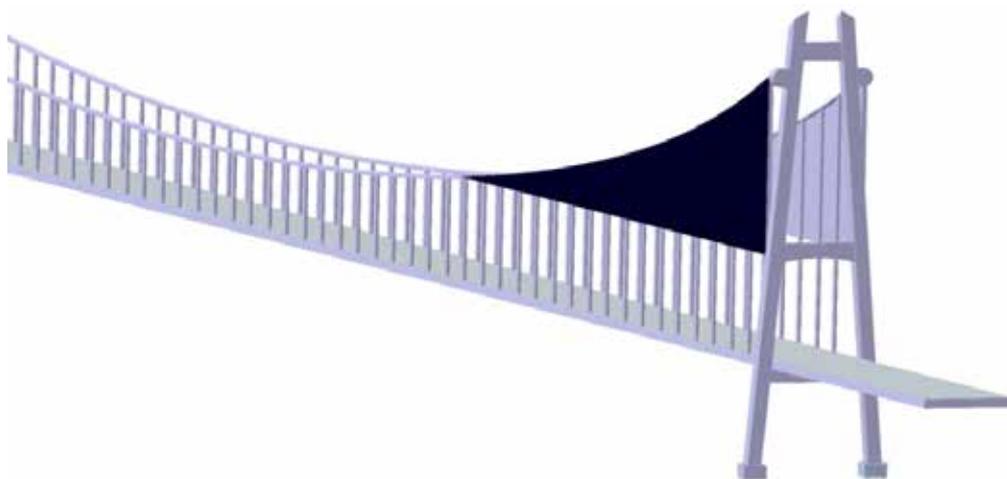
Panels mounted on the wires of a suspension bridge, SP
